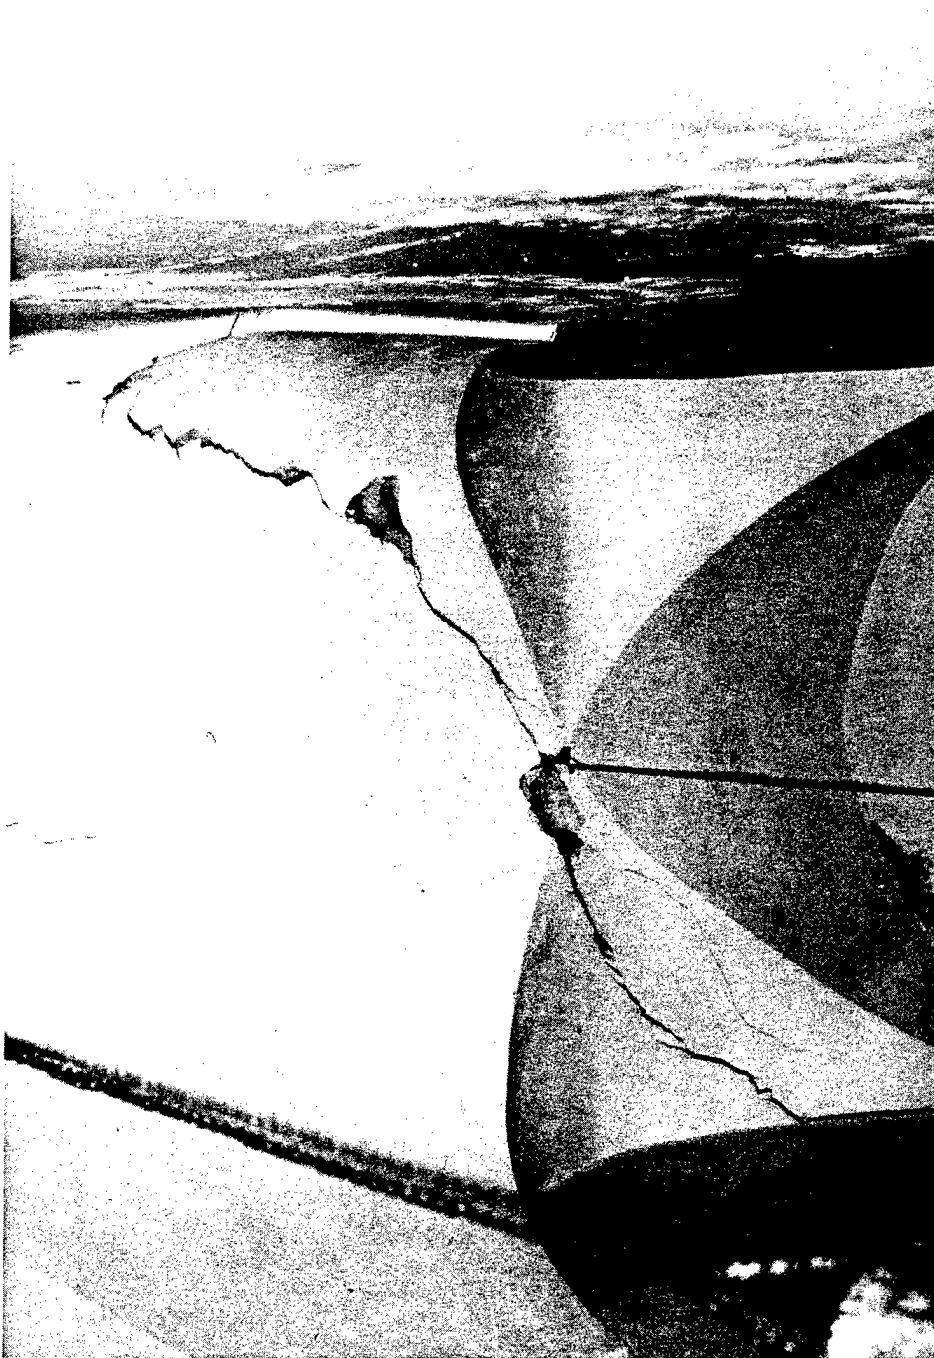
Ceiling of hallway on northwest side of Palace of the Amir Beshtāk showing large and extensive cracks
